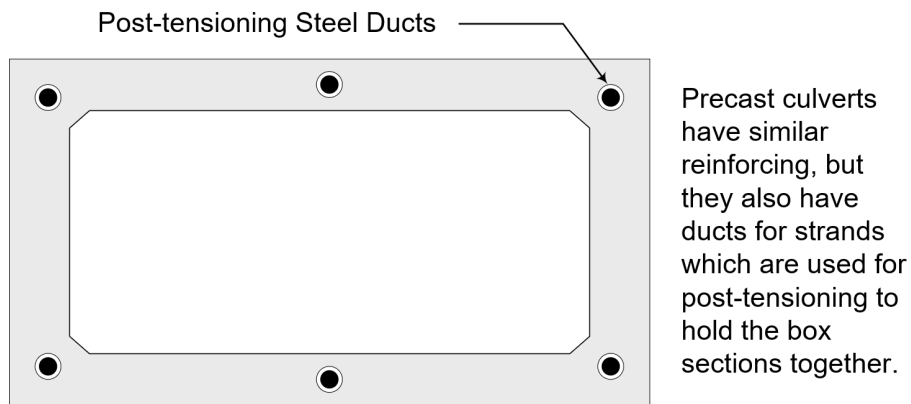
Precast Box Section with Post-tensioning Steel Ducts
